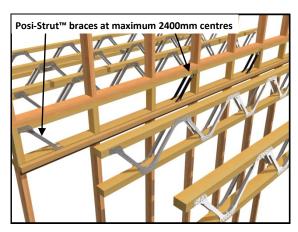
Posi-Joists™ Parallel to Internal Load Bearing Wall Using MiTek F-Frame
